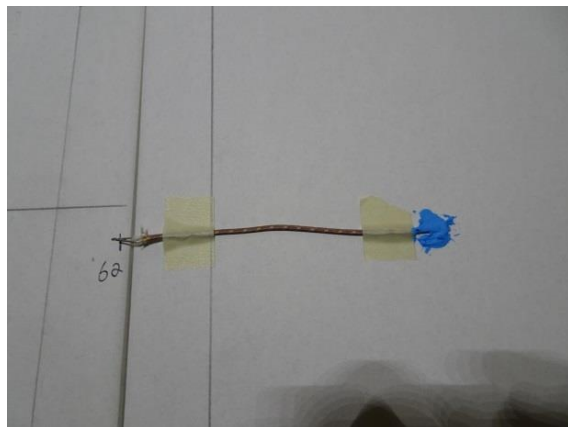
shows photographs of a group of embedded thermocouples. The embedded thermocouples were type K, glass-sheathed, 20-gauge, bare-bead thermocouples (Model GG-K-20-SLE-1000 from Omega). All holes drilled to install the embedded thermocouples were sealed with 3M Fire Barrier sealant FD150+ to maintain the integrity of the NLT panels and gypsum board. The thermocouples installed between layers of gypsum board and between gypsum board and NLT were run such that a length of approximately 150 mm ran along the surface of the NLT or gypsum board. This was to reduce the impact of heat transfer along the wire and minimize the effect of the holes drilled for installation.
